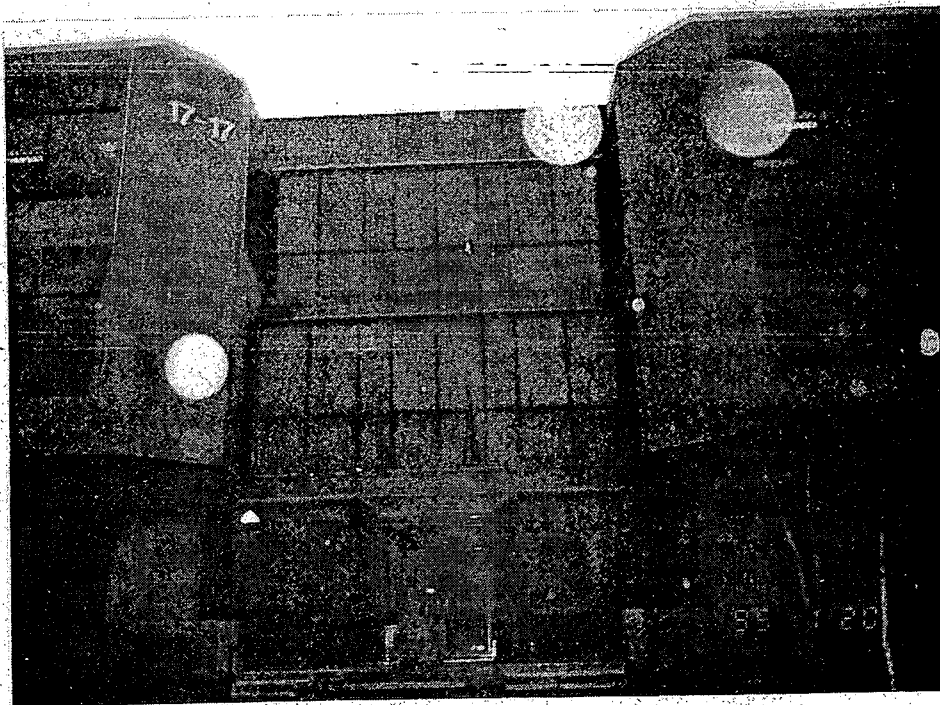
Front of subject building, 17-17 Rt. 208 N.
